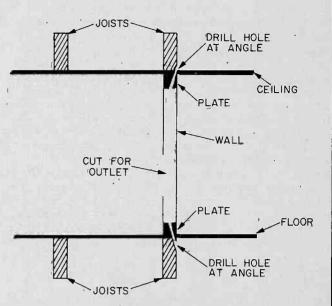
If you should be so unlucky as to have the wall directly under or over a joist simply drill in at a shallow angle—but be careful the angle isn't so flat you come out in the room outside the wall. A 12-in. or 16-in. extension for the drill bit will allow you to easily drill at better than 45 degrees to the ceiling or floor.
